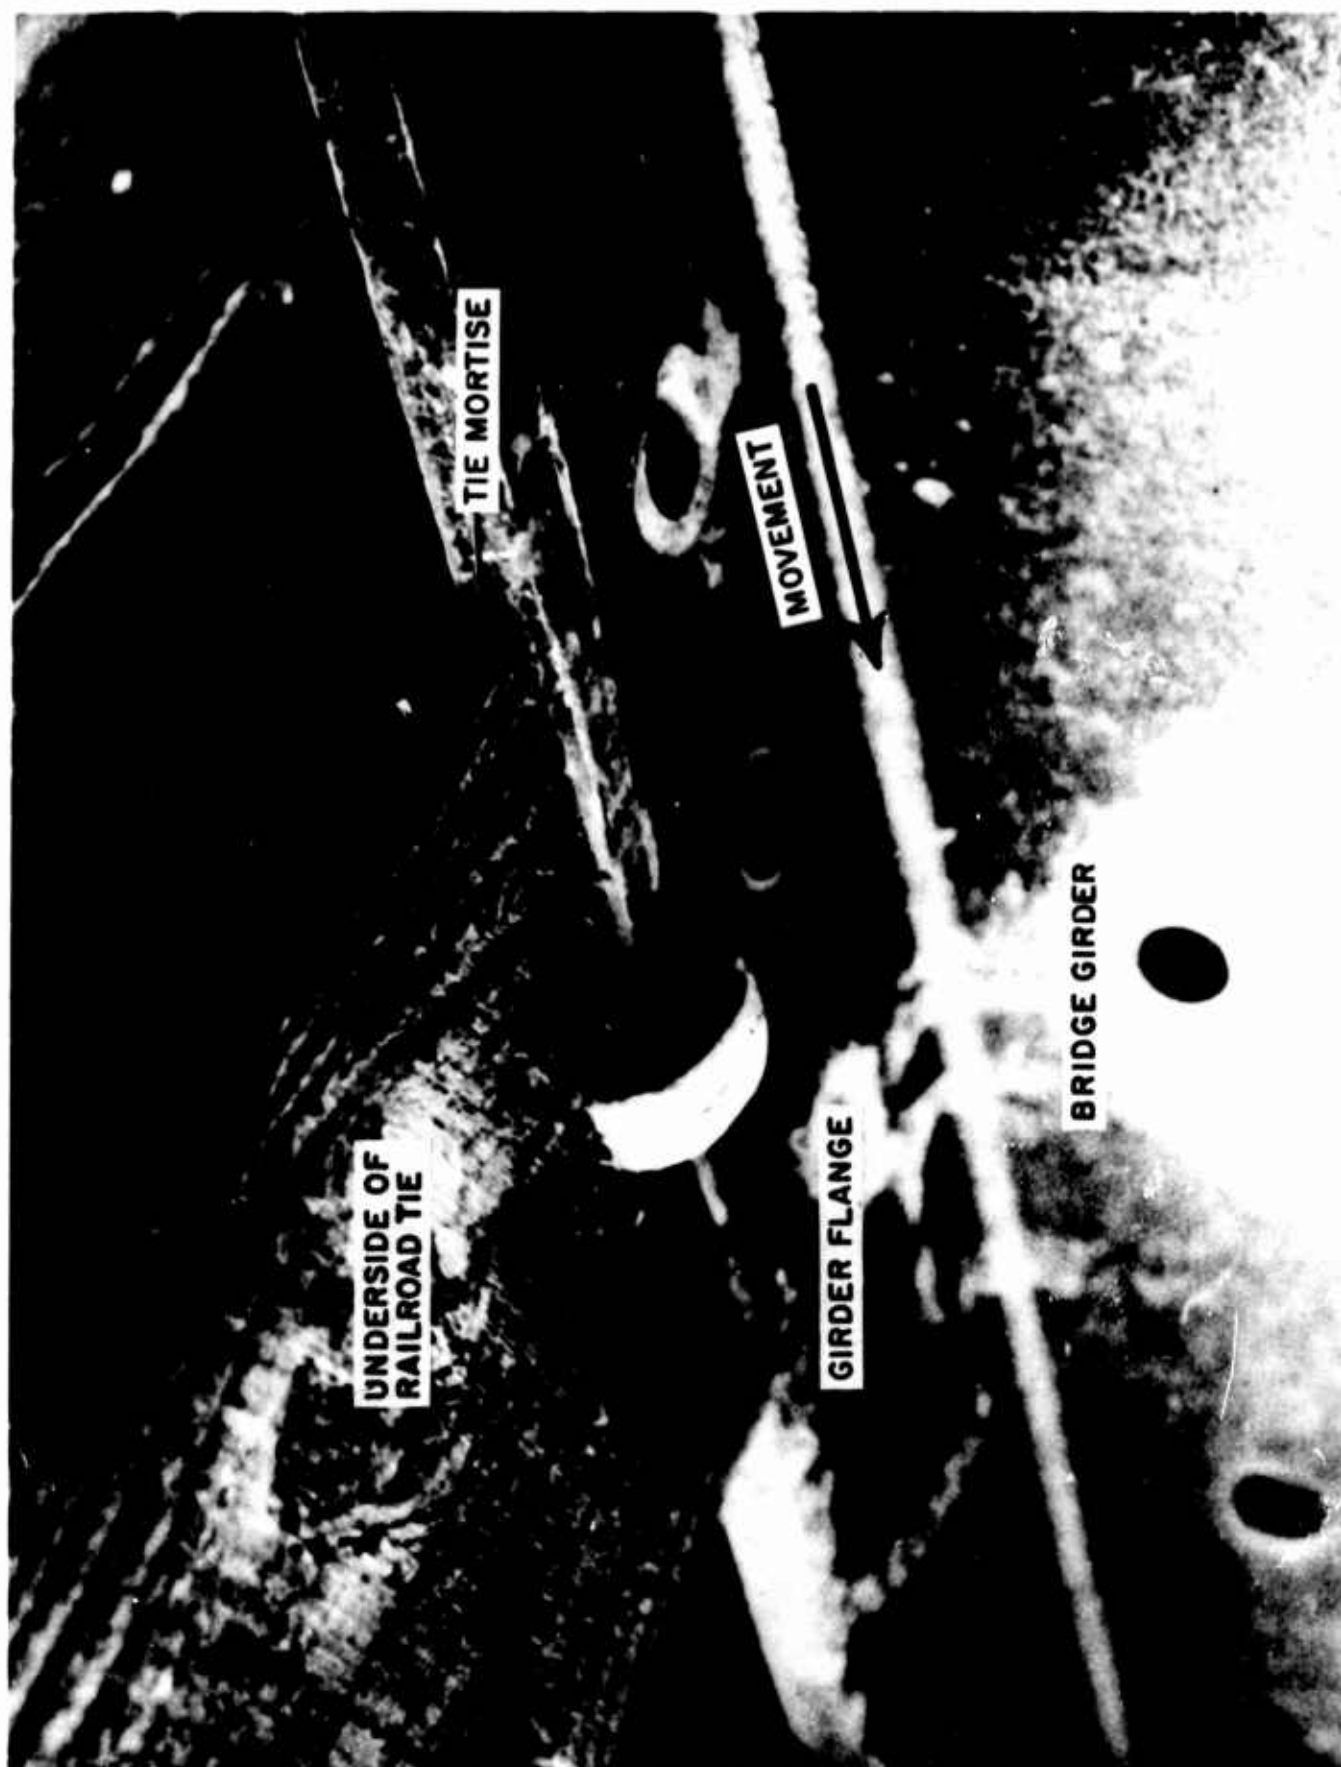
L Street Slide (Track movement at the Ship Creek railroad bridge)
